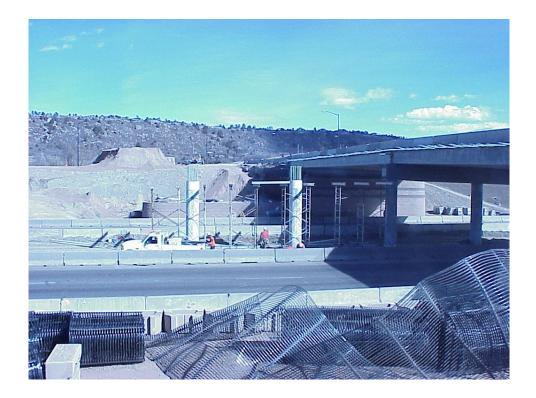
Rolls of Tensar UX 6 geogrid placed below the bridge foundation.
